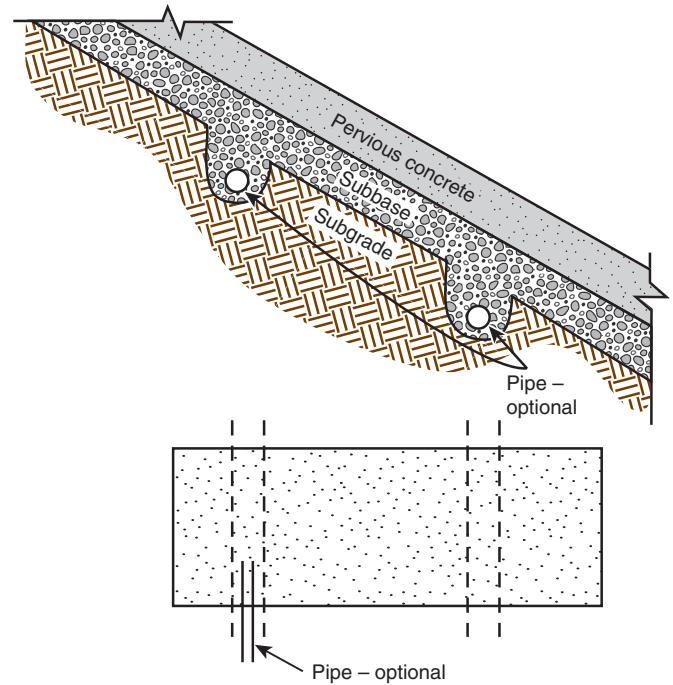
Elevation (top) and plan (bottom) views of a sloped installation. For sloped pervious concrete pavements, storage capacity calculations must consider the depth of pavement, infiltration rate of subbase, and desired runoff goals. Source: Tennis, et al, 2004.
